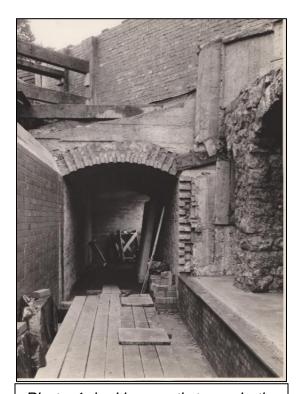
looking south towards the High Street, shows brick and concrete work 1957
